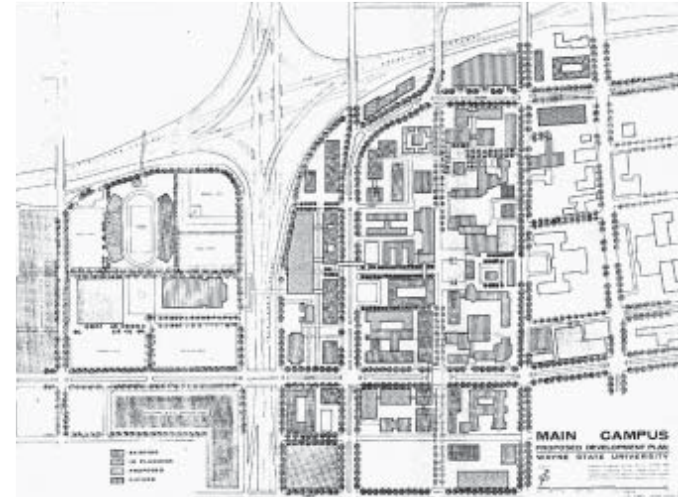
Sasaki, Dawson & Demay Plan 1962-1967
